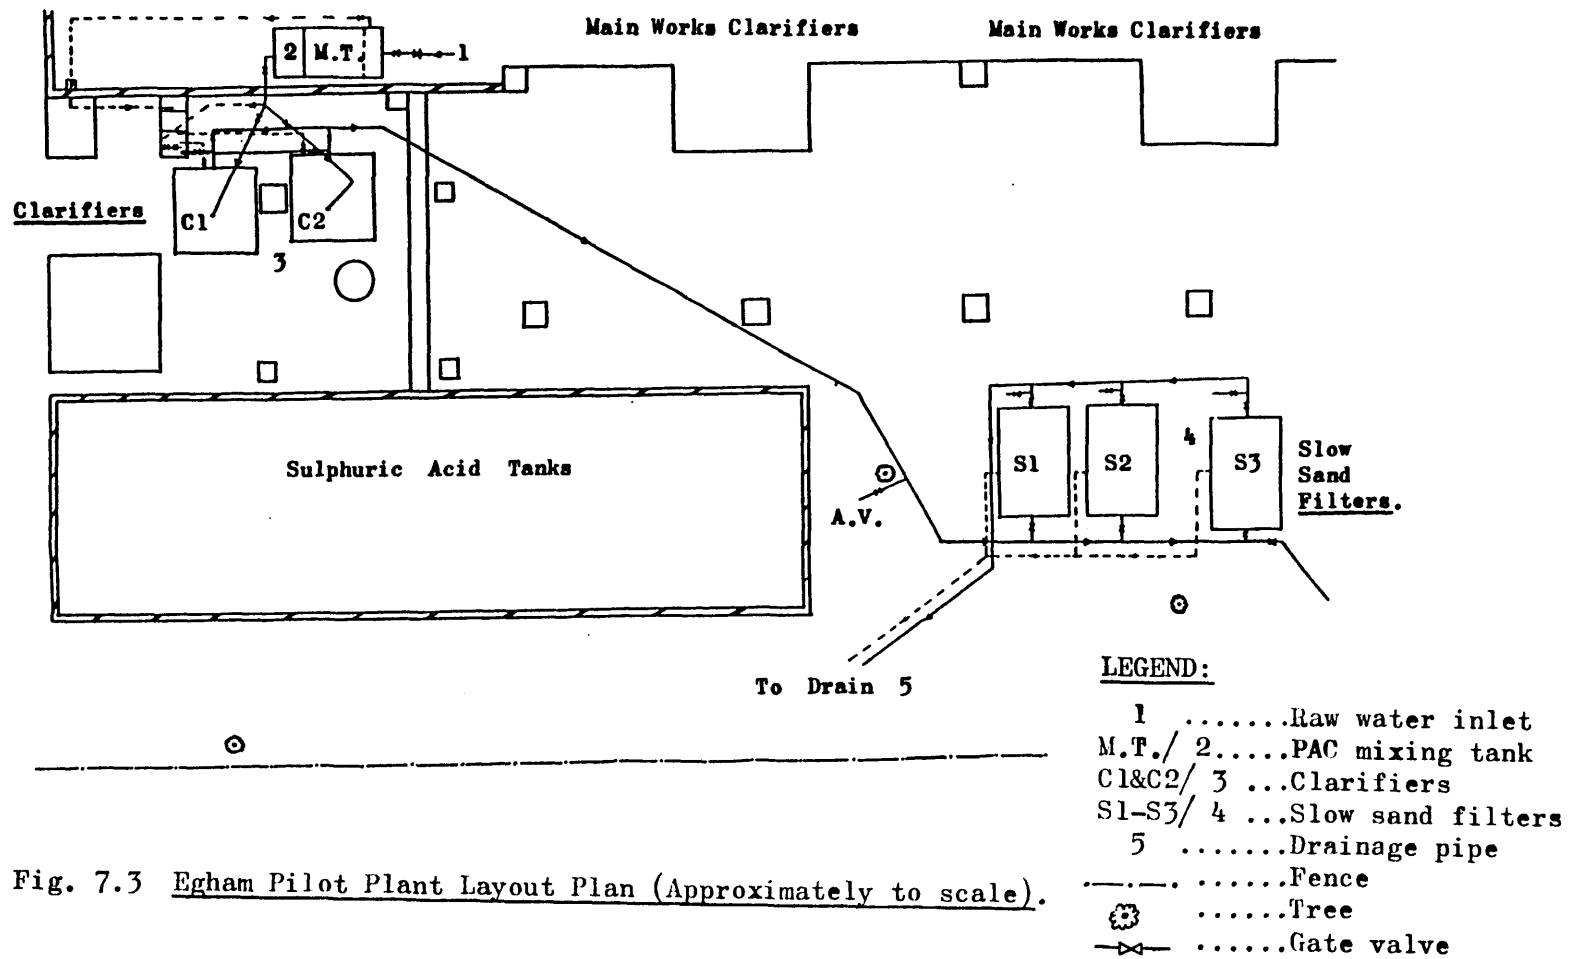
Egham Pilot Plant Layout Plan (Approximately to scale).
